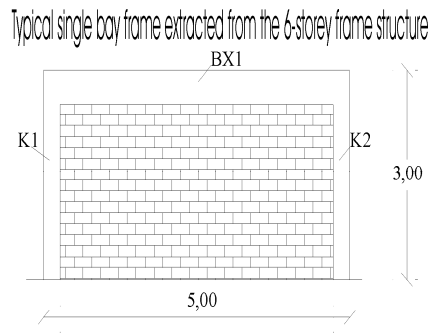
Typical masonry infilled frame unit of the 6-storey building.
